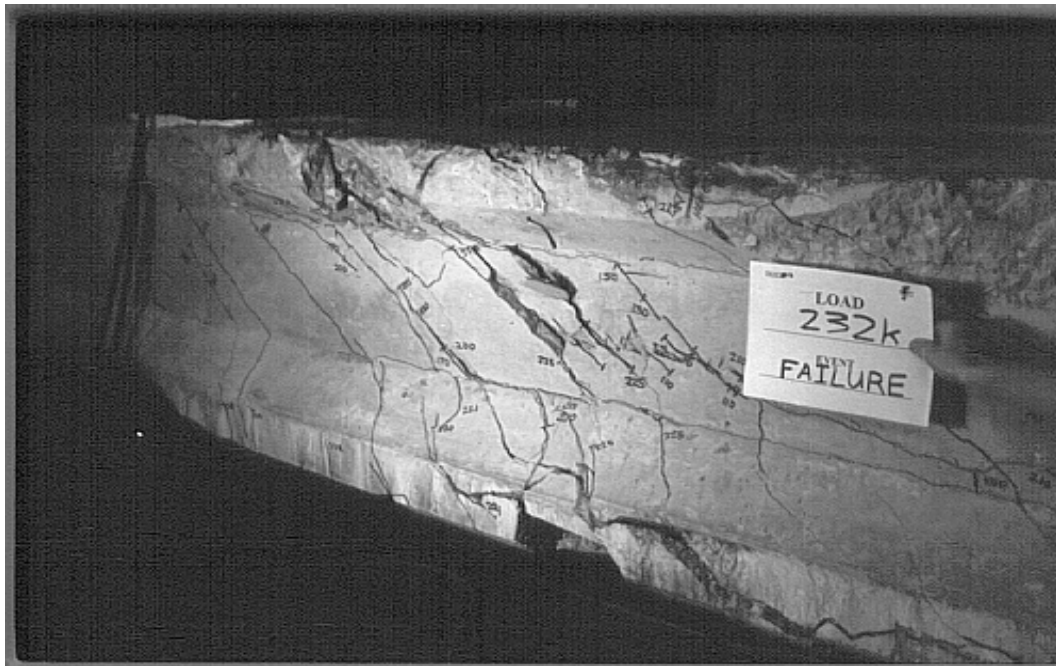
Concrete Crushing on the West Face at Failure of Box Beam 5
